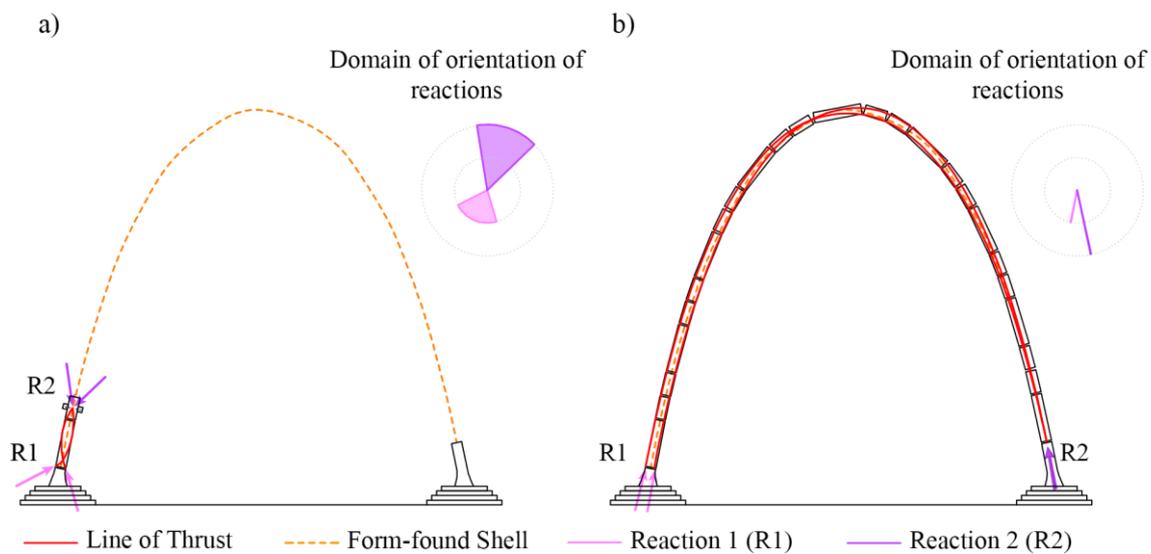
Domain of orientation of the reactions R1 and R2. a) first construction stage b) last construction stage of the central arch.
